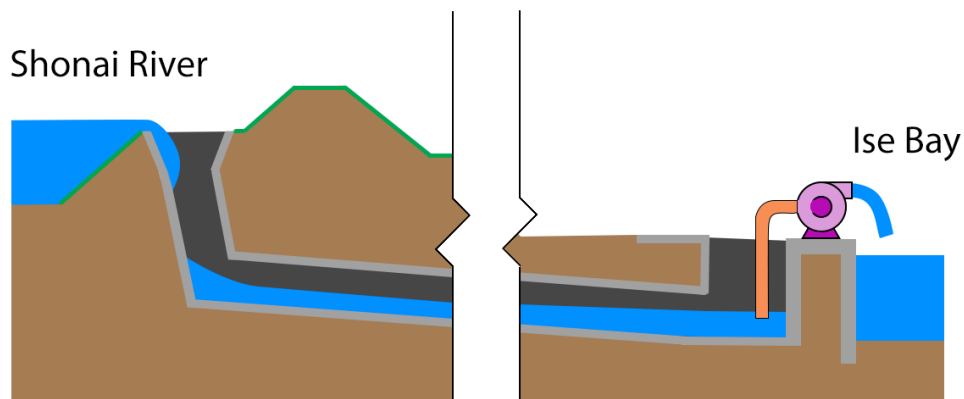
Flood discharge diversion by converting metro tunnels to drainage pipes
